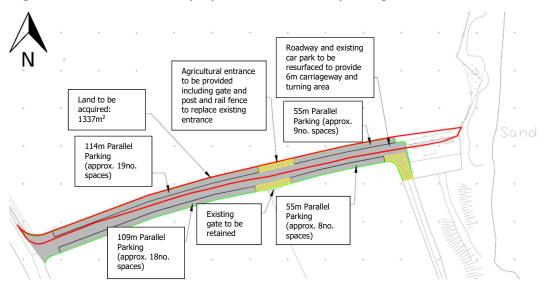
Proposed Car Parking near Baginbun Beach | not to scale
